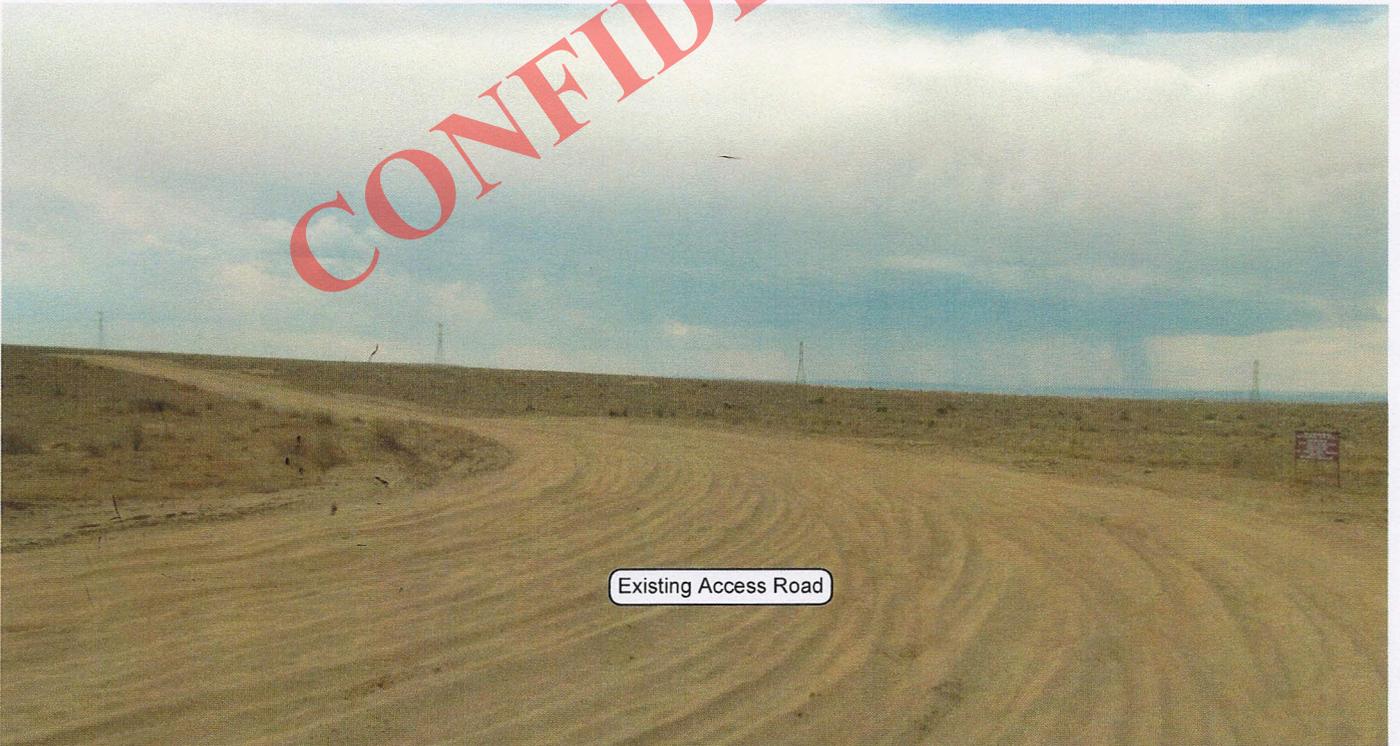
PHOTO VIEW: FROM EXISTING ACCESS ROAD      CAMERA ANGLE: SOUTHERLY
